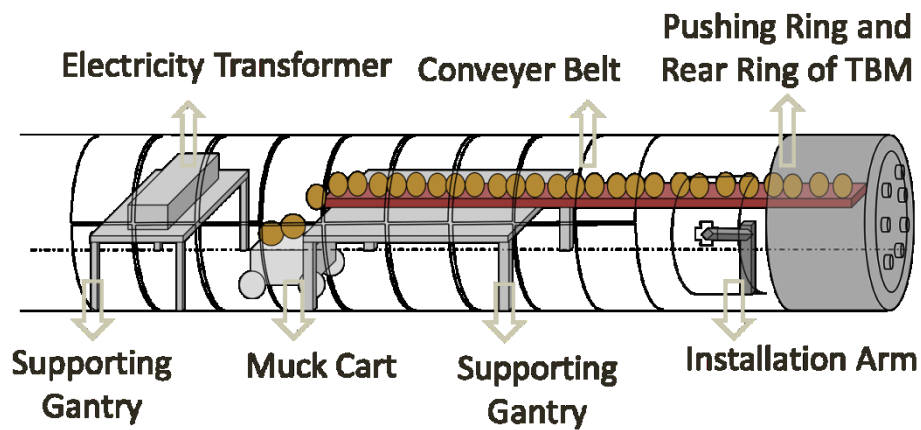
Tunnel boring machine and supporting facilities (Looking from side).
